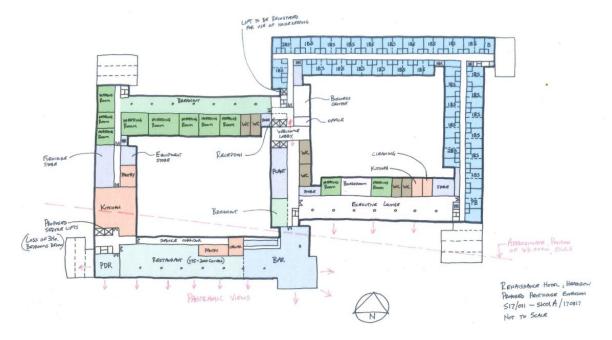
Sketch Master Plan of proposed additional floor dated 18/08/17
